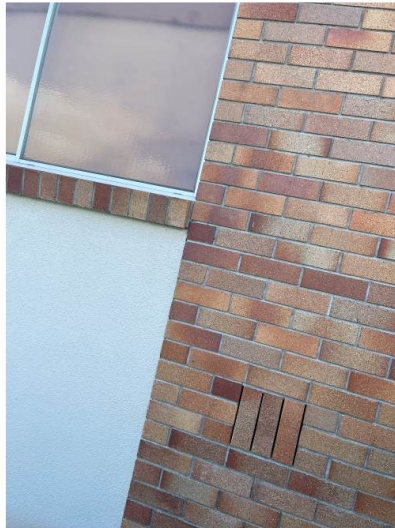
Slight Cracking to Mortar at Western Windowsill
